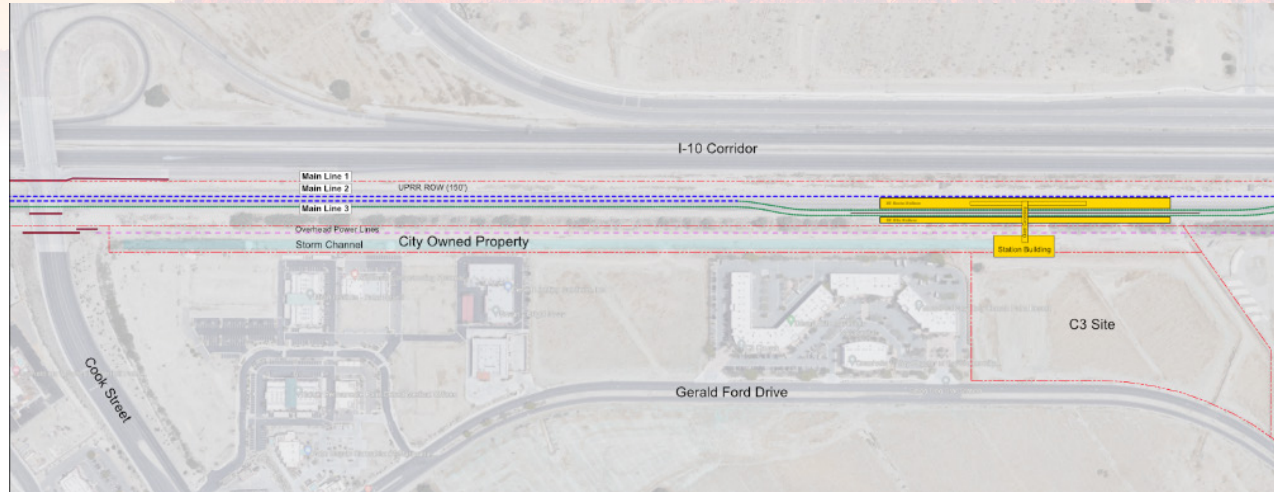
Palm Desert Transit Facility Conceptual Site Plan #2
